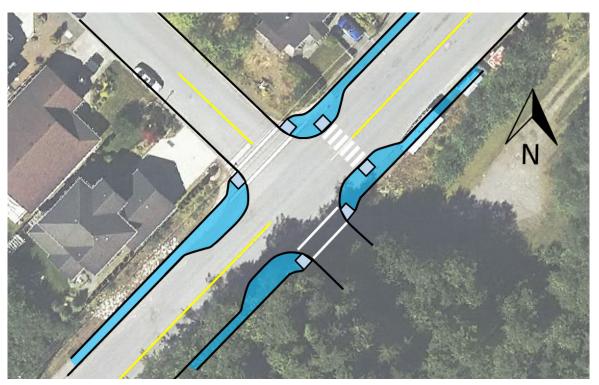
Conceptual Design for Curb Extensions on 11th Avenue East
